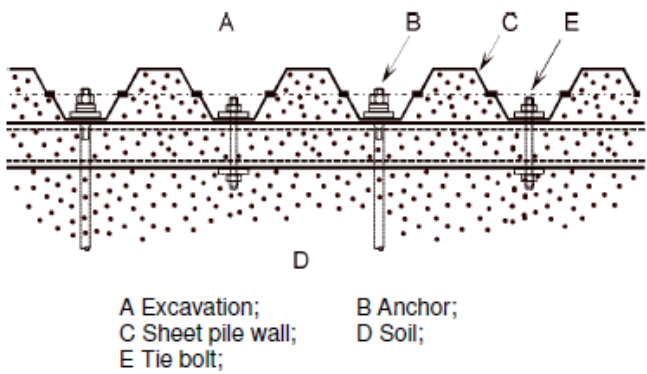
anchoring with waling behind sheet pile wall (EN 1993-1 part 5); not possible for underwater anchors [11]
